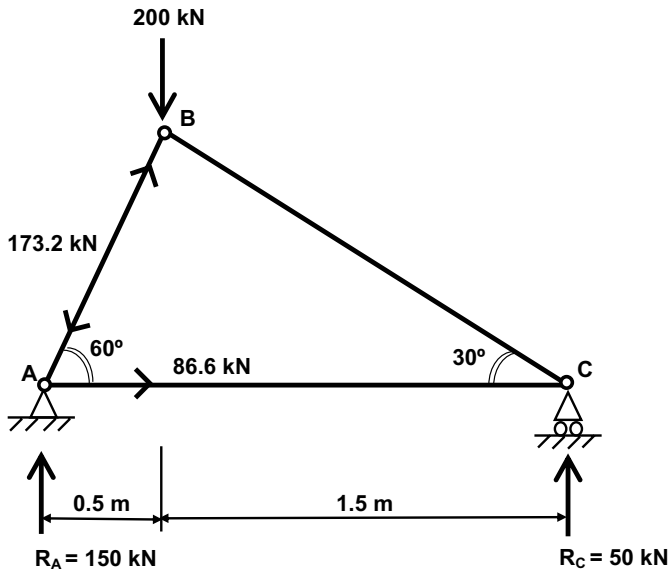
Worked example No. 2 – forces in members AB and AC calculated.
